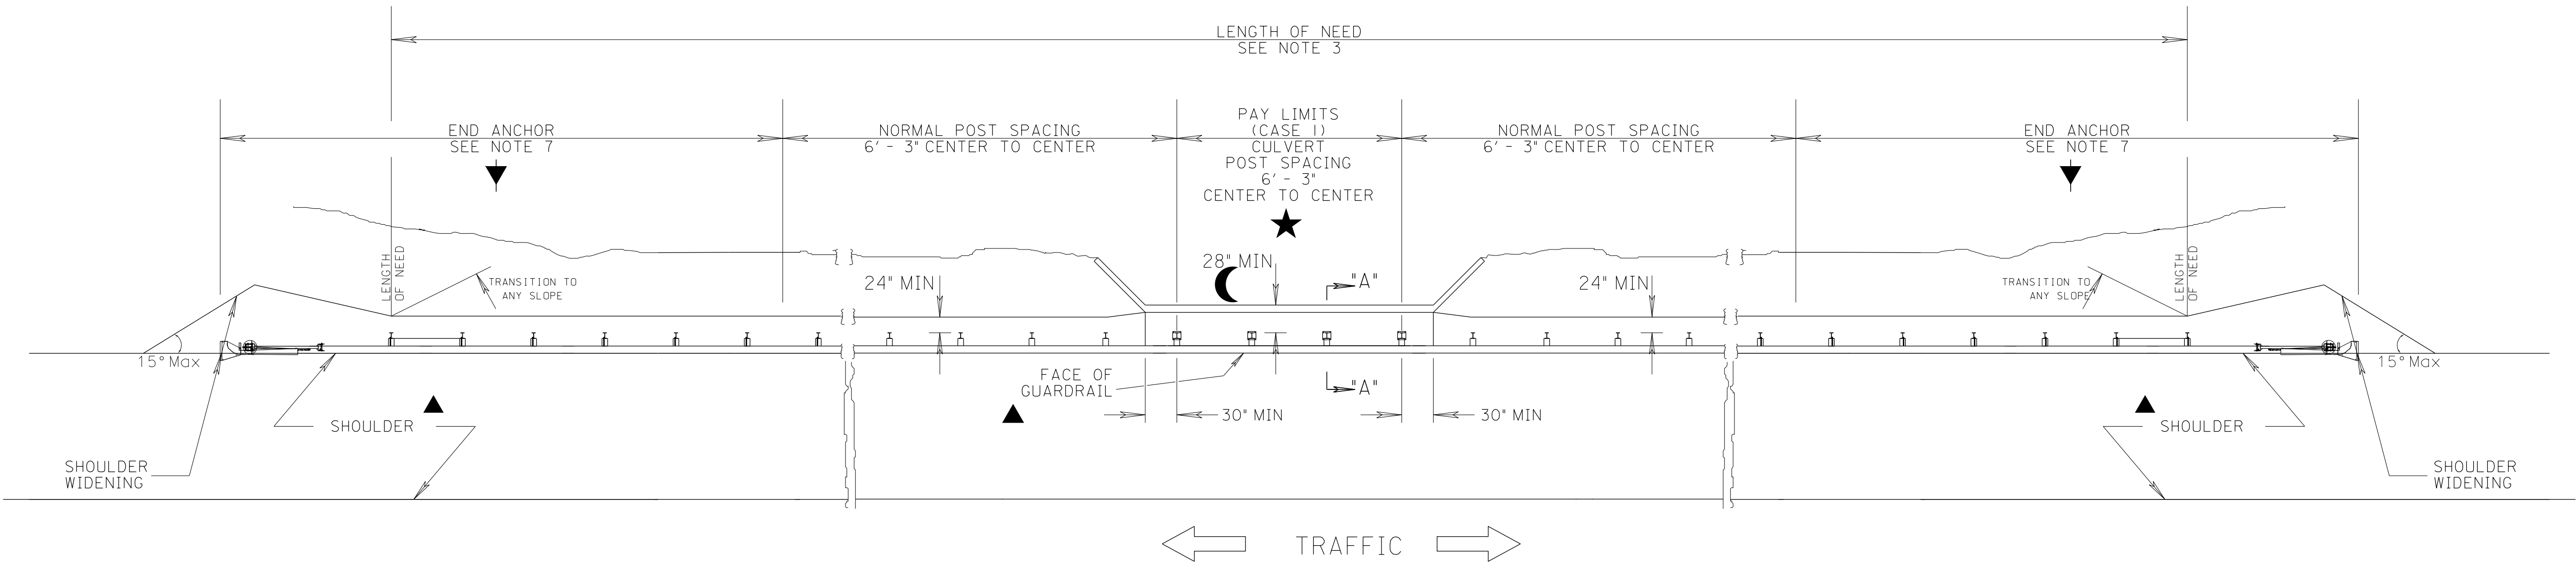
DETAILS OF GUARDRAIL AT BRIDGE PIER
